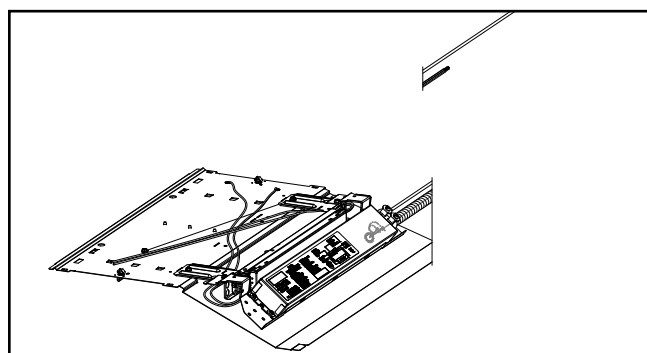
Emergency bracket and emergency battery mounting on to backside of fixture
